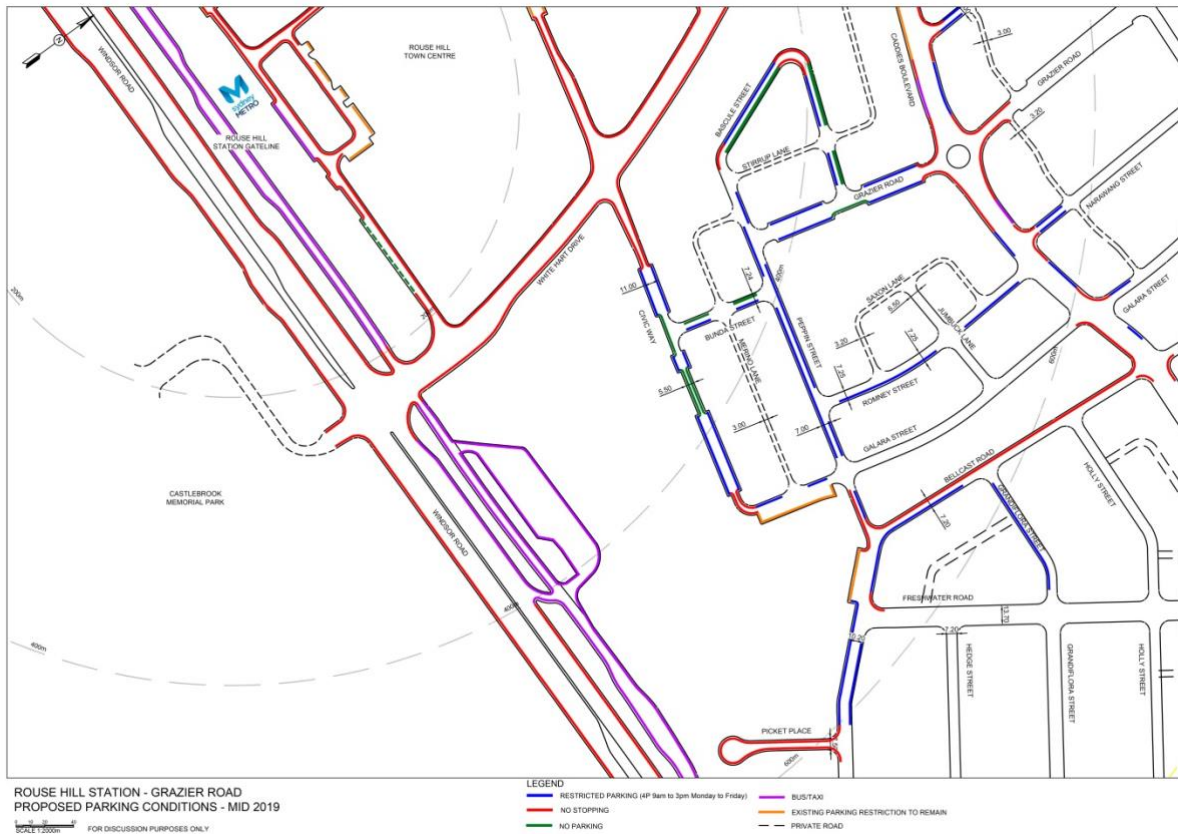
Proposed parking conditions mid-2019 – Rouse Hill streets south east of station
